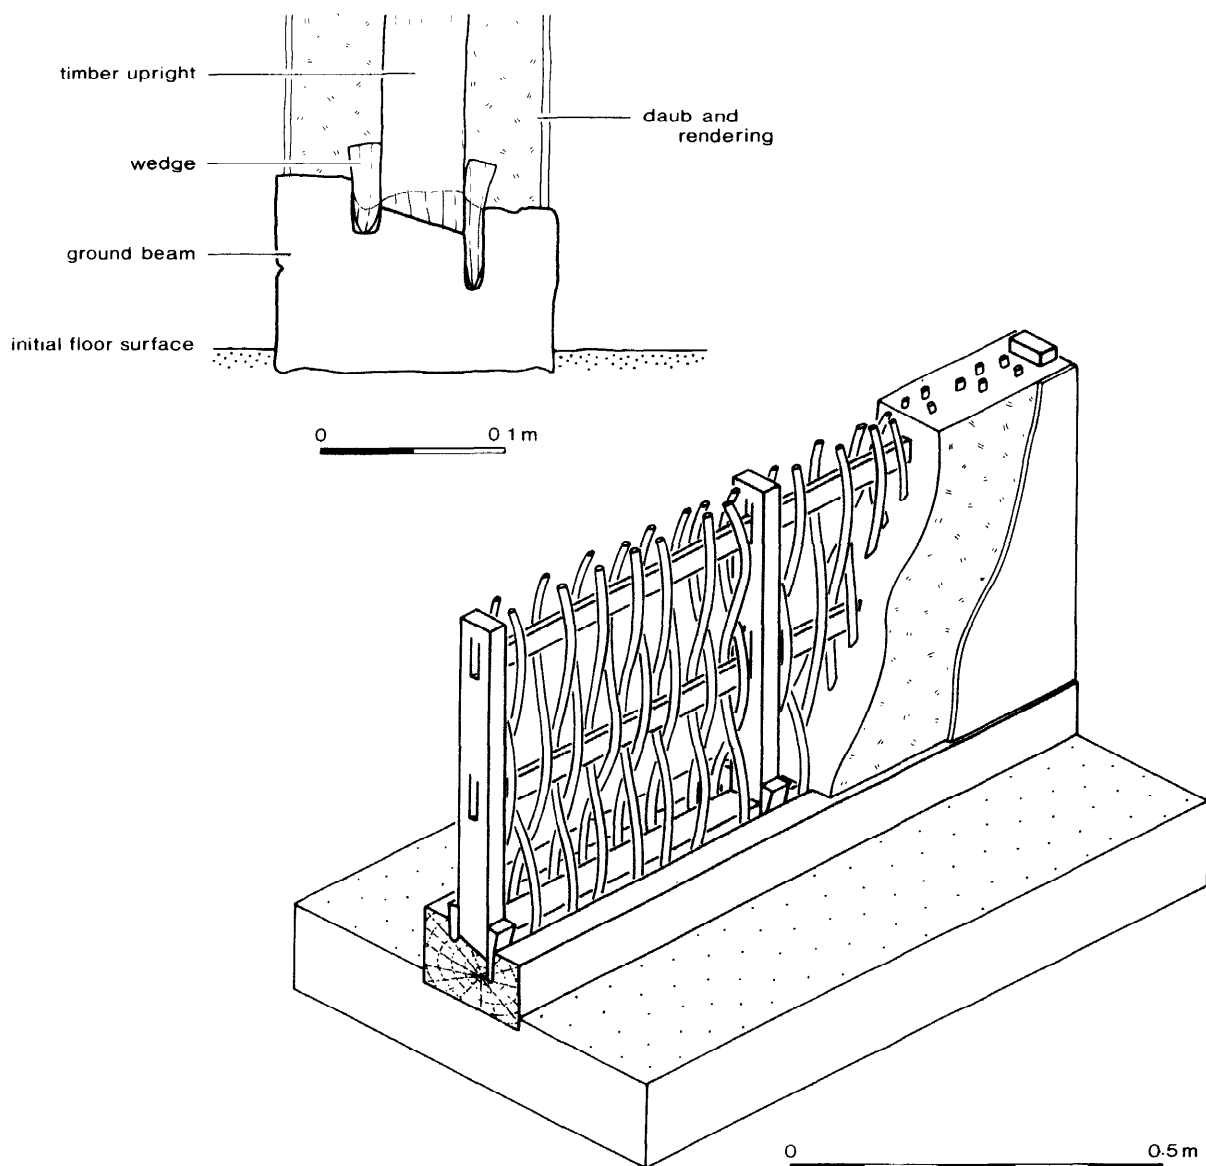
15-35 Copthall Avenue, controlled excavation: cross section through ground-beam (393) with conjectural wall above (grey represents timber as found), and reconstruction of partition wall (grey represents timber)
